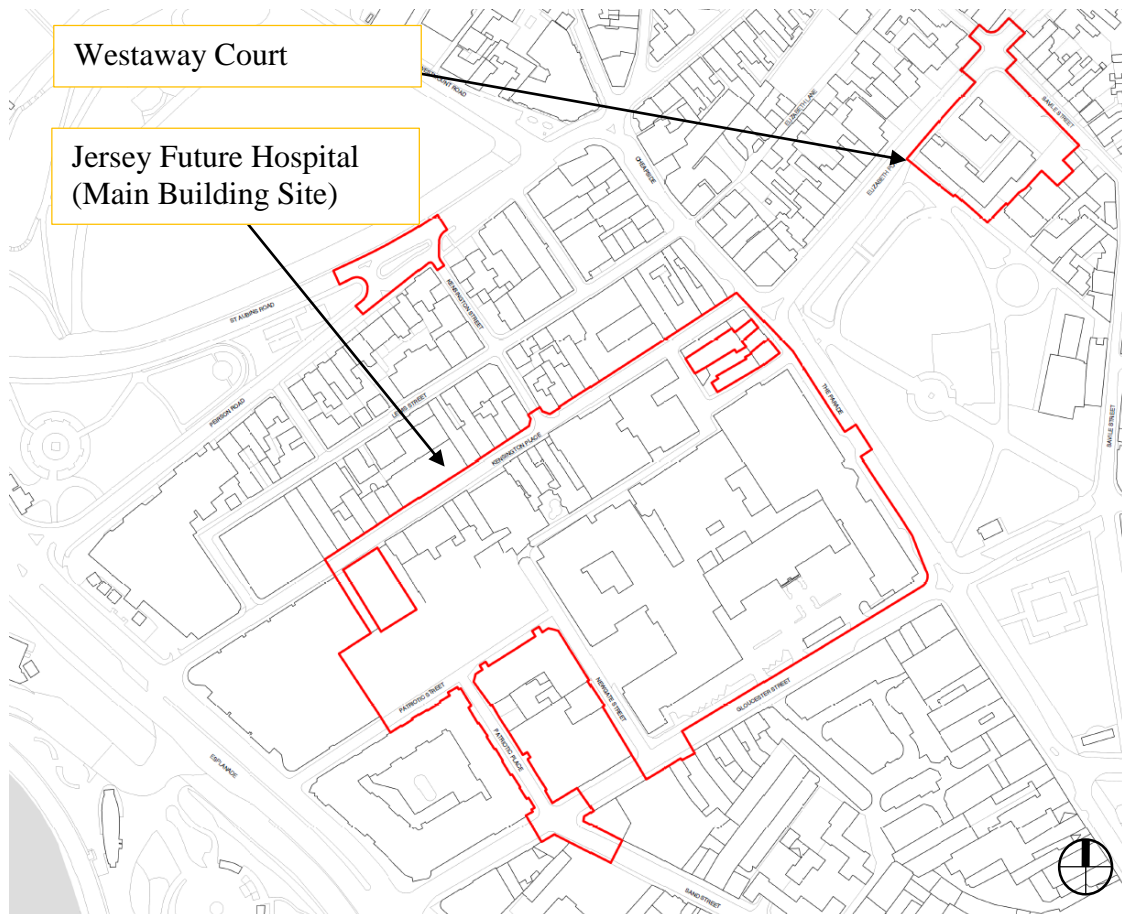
Plan view of Jersey Future Hospital and Westaway Court
